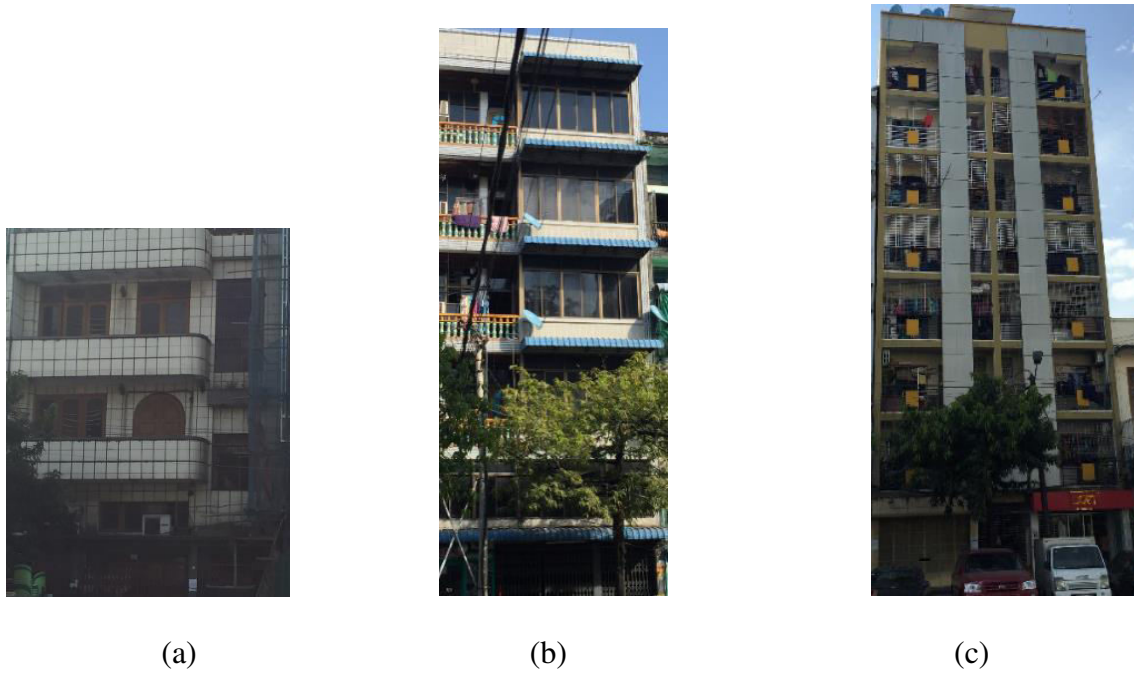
Photos of typical RC buildings (a) 3 stories (b) 1 unit 6 stories (c) 8 stories
